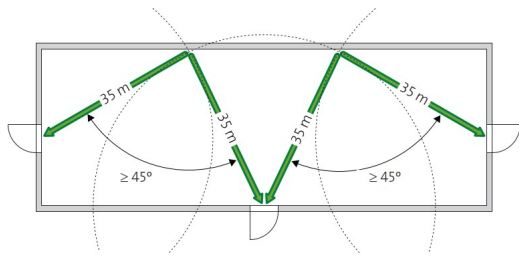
Length of escape route from single-exit rooms to escape to a safe area or secured stairway
